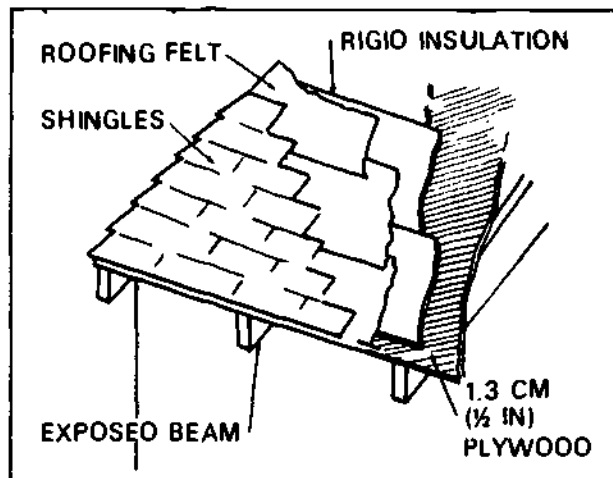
Rigid insulation placed over plywood ceiling with exposed beam.
